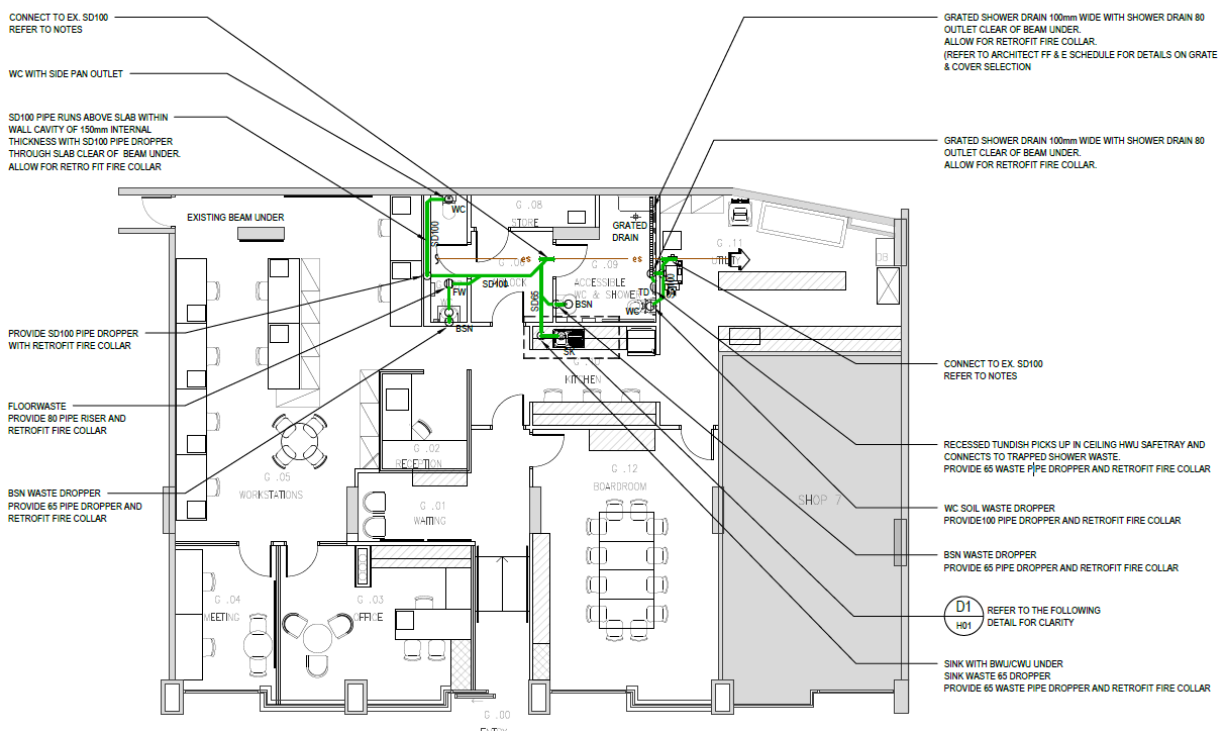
Hydraulic Services Plan – Drainage Services Layout (Source: VOS Group 2023)
